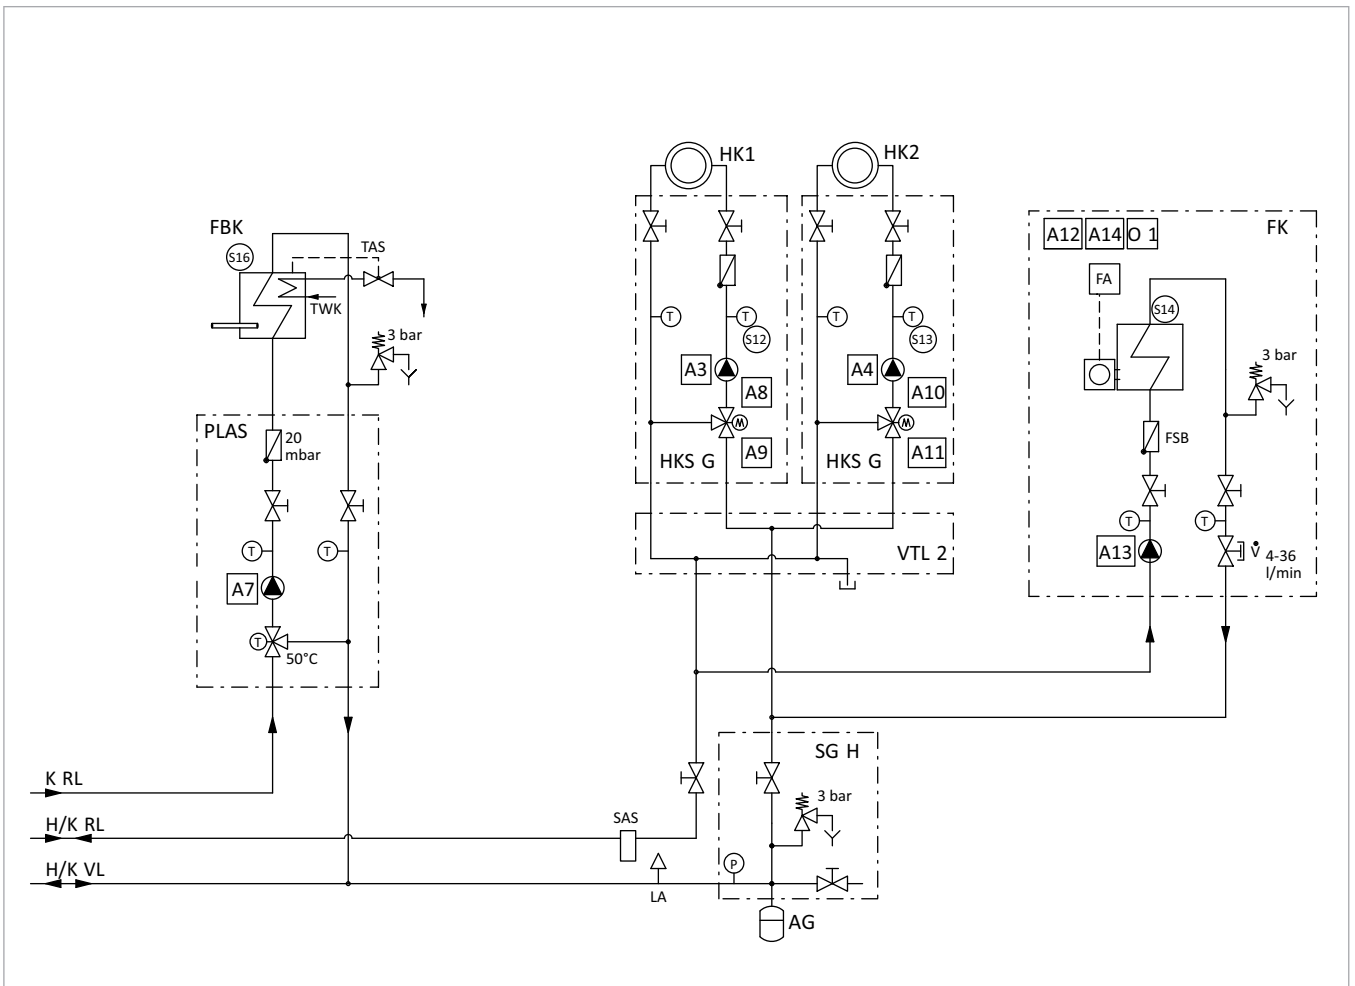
SolvisMax Solo with third-party boiler, solid fuel boiler, two mixed heating circuits – Part 2
